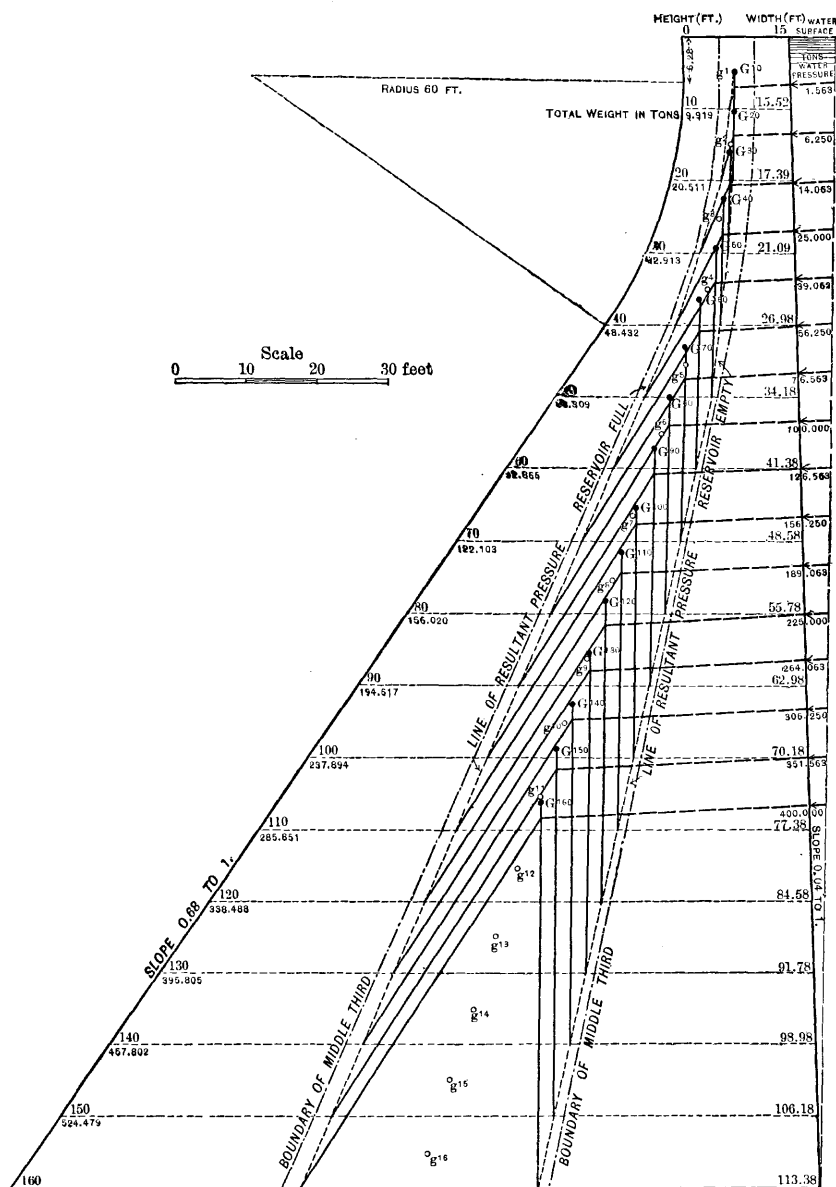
Section of masonry dam for Gibraltar reservoir based on concrete weighing 130 pounds per cubic foot.
